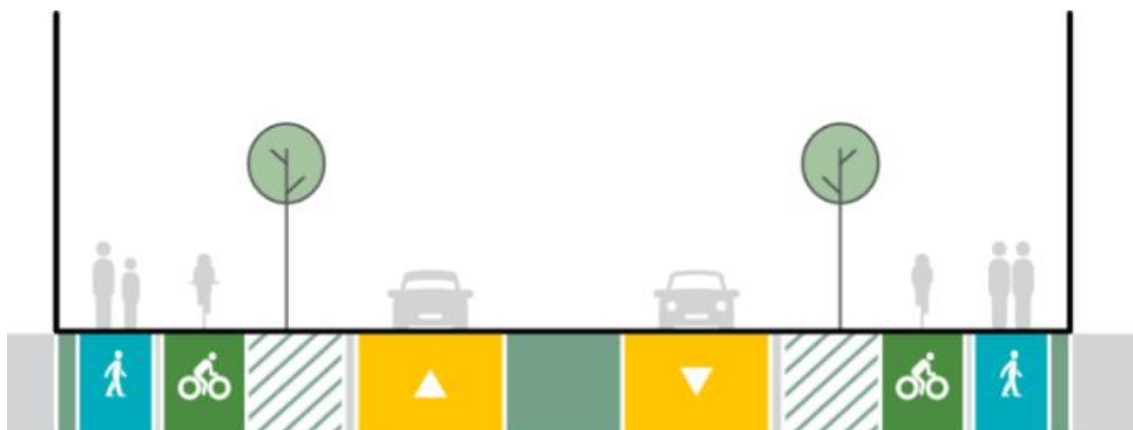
Indicative future Hobsonville Road corridor between Brigham Creek Road and Hobsonville Point Road
